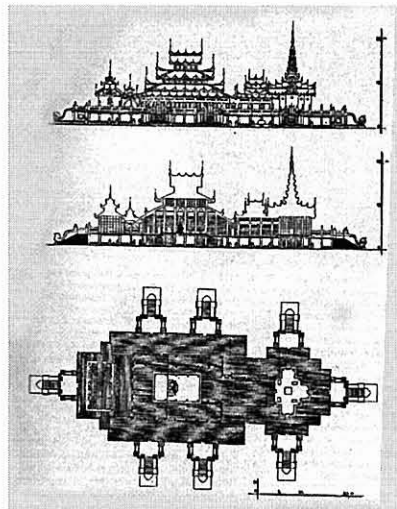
Plan, section and elevation of Shwe-in-bin monastery, Mandalay, built in 1895
